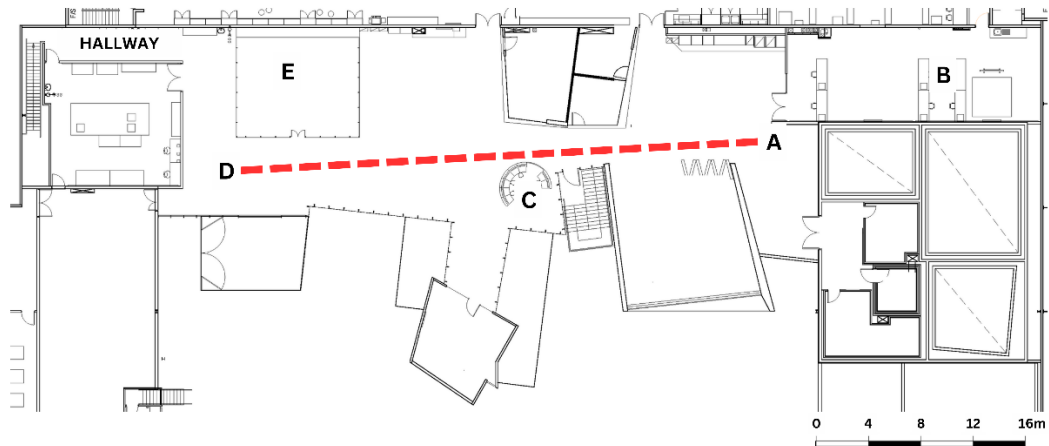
UTS tech lab floor plan, A: Point A, B: Point B, C: Point C, D: Point D, E: Point E, dashed line: line of sight.
